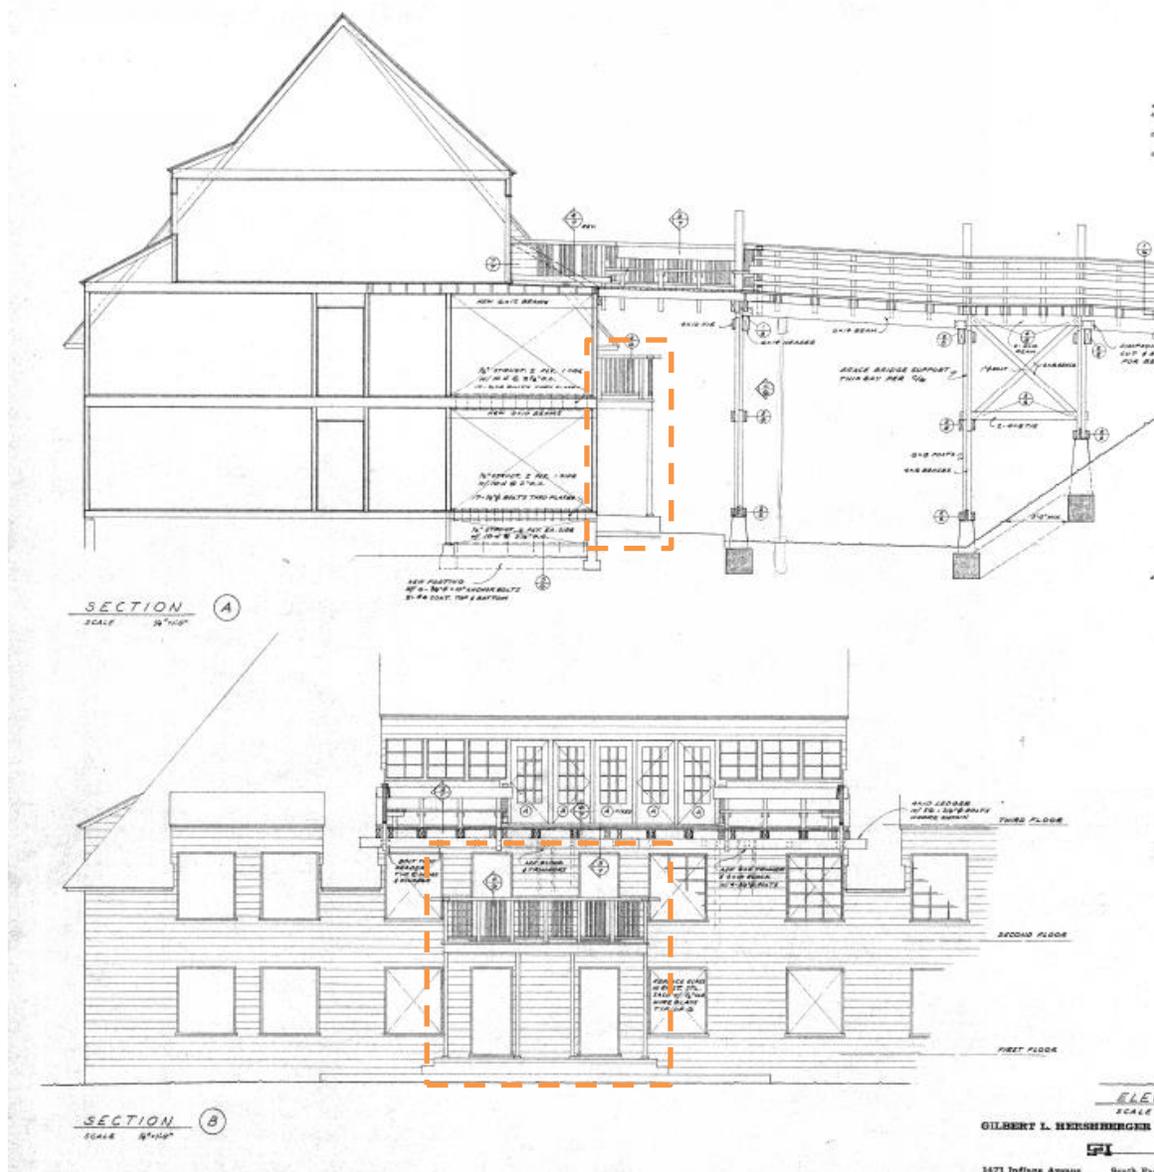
The north (upper) and west (lower) elevations of Cedar Lodge from the 1984 plans to add the deck/bridge structure. Note the two-story porch and balcony that was at the plan west façade (in dashed outline). Source: Sheet 6, Cedar Renovations – Bridge & Porches, Gilbert L. Hershberger, April 10, 1984, edited by Page & Turnbull.
